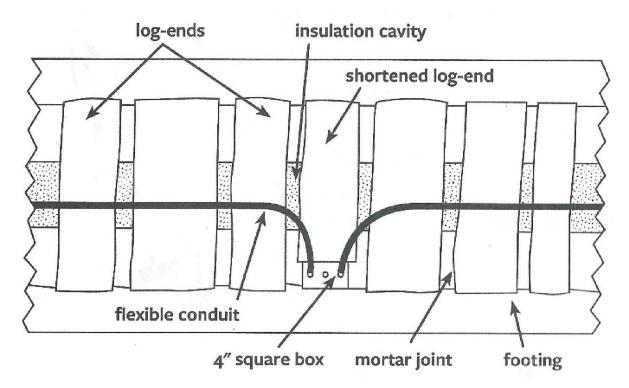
Example of how electrical wiring can be built into the cordwood wall in the insulation part; source: [CoCoCo, n.d., p. 100].
